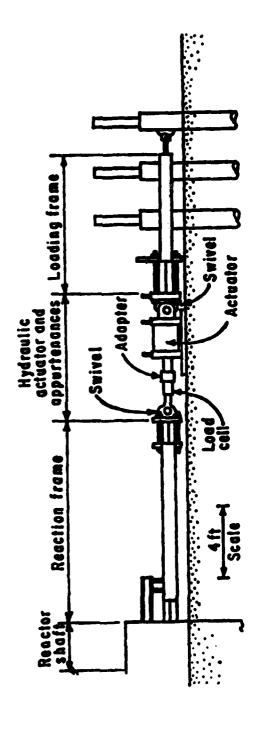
Schematic drawing of the loading system for the pile group.
